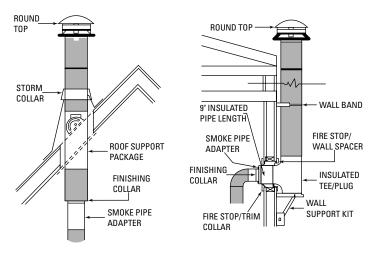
Prefabricated metal chimney and vent details (ceiling support installations).
